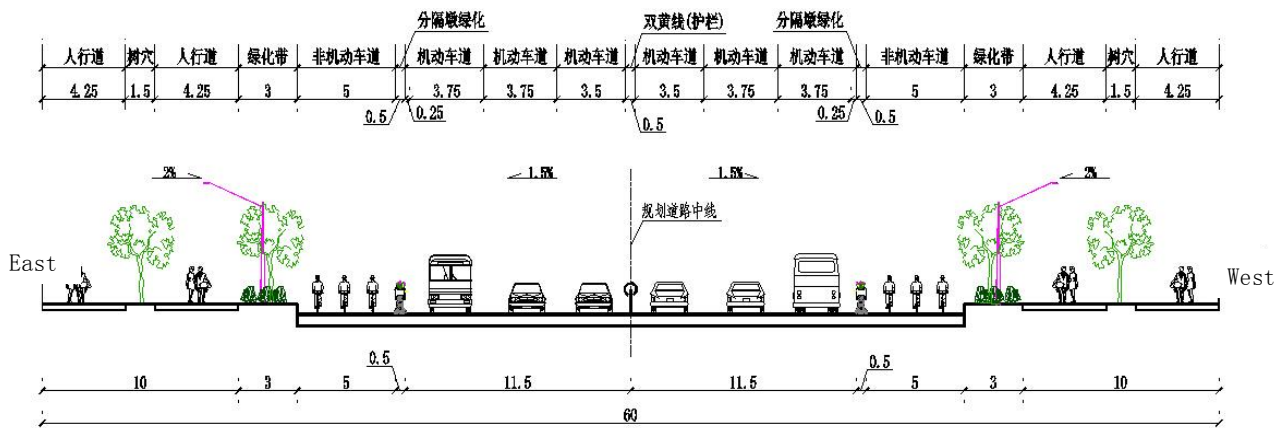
Standard Sectional View of Planned Taibai Road (Yinxing Avenue to Anwei Bridge)
